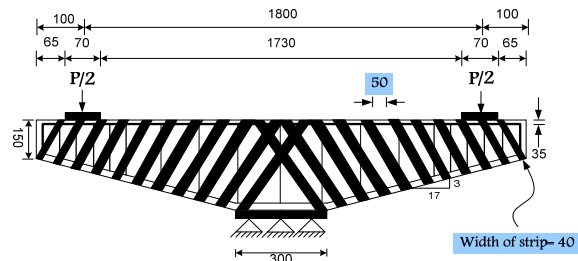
Details of hammer head beam (TB-0.5S-C45°)
